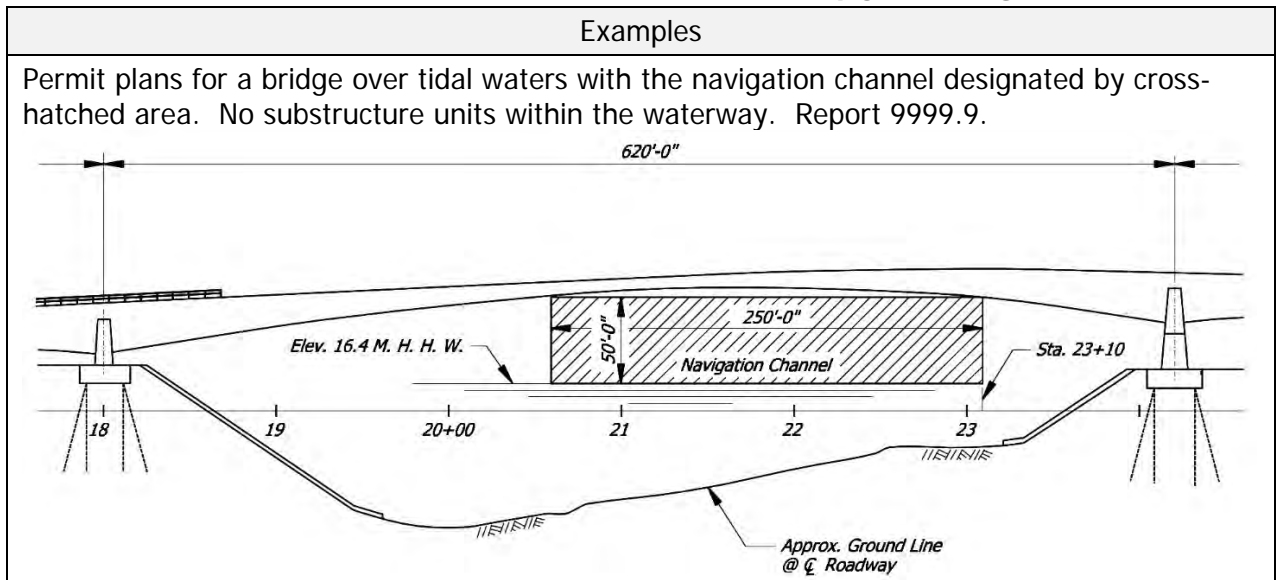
Bridge elevation view with no substructure units in the waterway. (Source: Alaska DOT)
